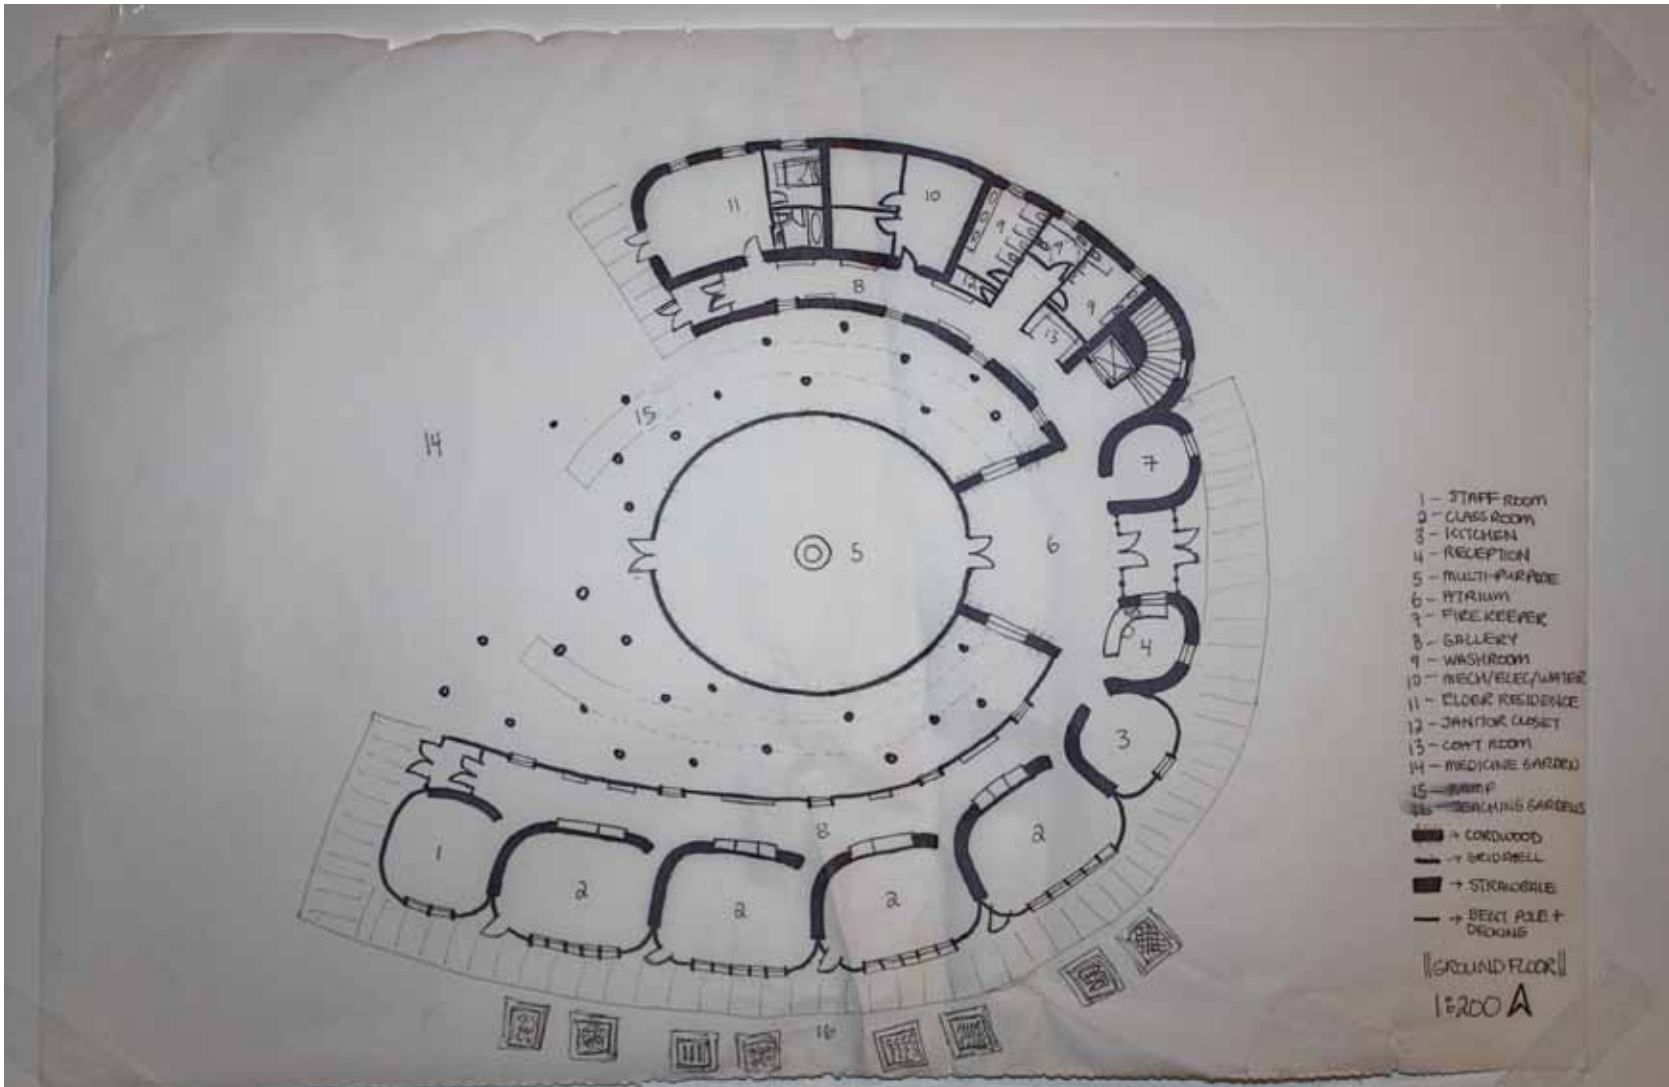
Sixth iteration: Ground plan with gathering space separated from main building allowing more light, connection to nature and clear structural system
